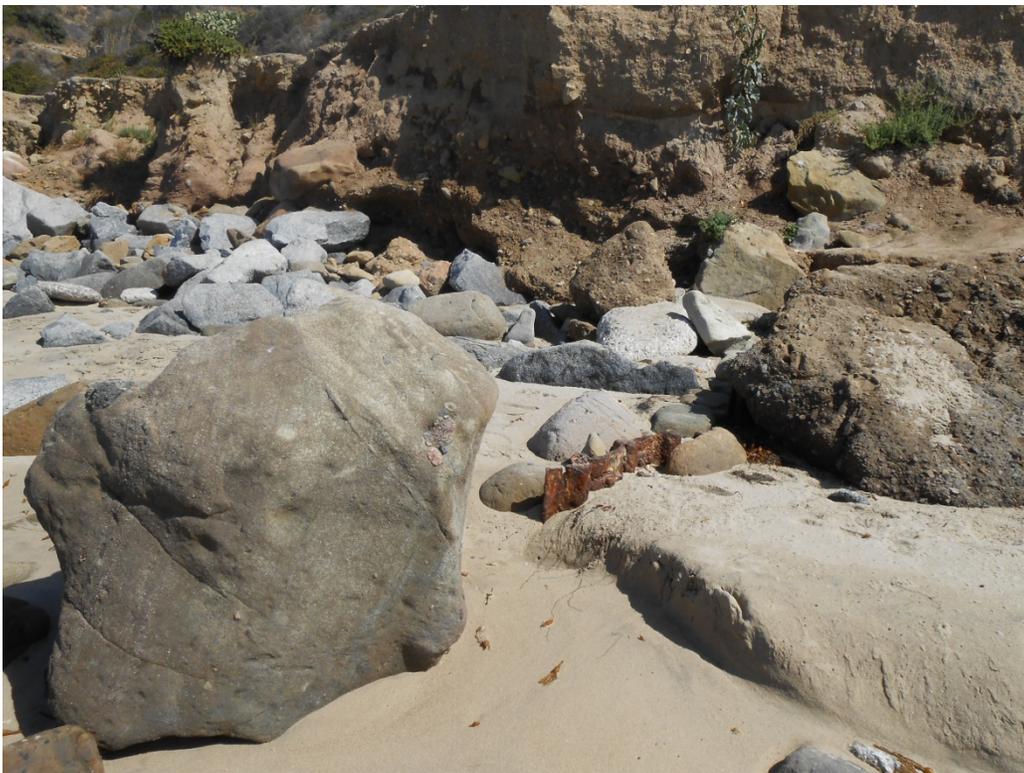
Site 16 – Native Boulders and Imported Granite Boulders on Beach Providing No Protection for Embankment
